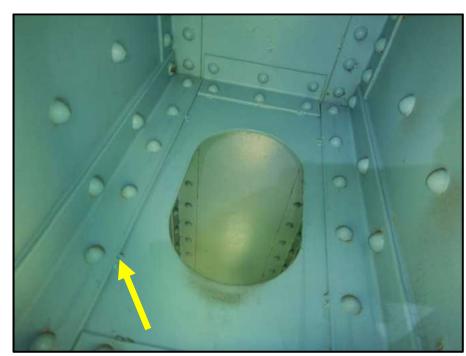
West L15L16 at L16, angles along web are tack welded to internal diaphragm of lower chord box member.
